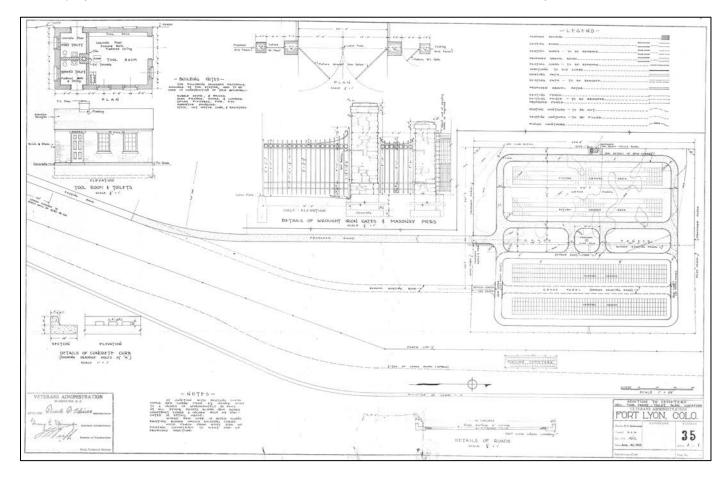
Addition to Cemetery, including the Tool House – Toilet Building Location, 1943.
